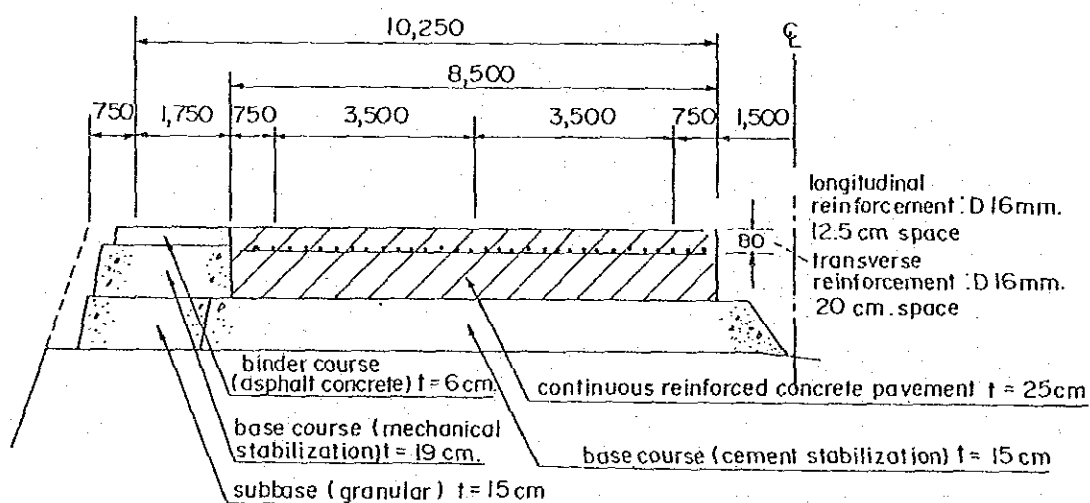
Standard Cross Section of the Continuous Reinforced Concrete Pavement
